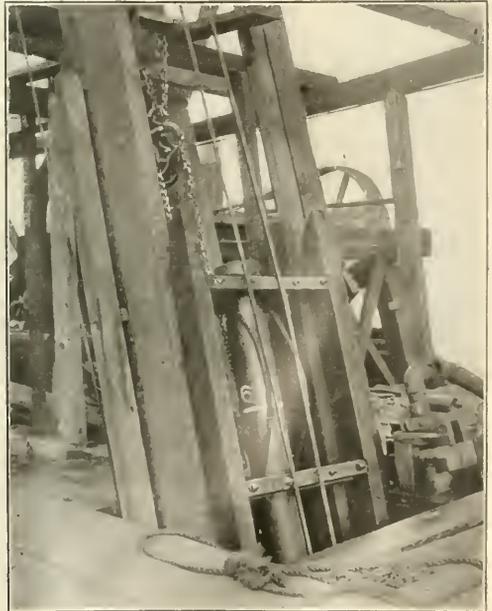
CROSS-HEAD USED TO SUPPORT PIPE IN SHAFT
